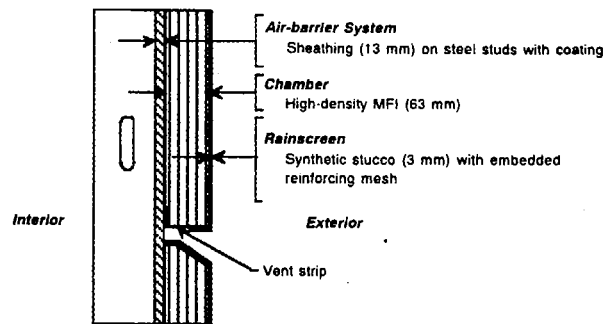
Vertical section of EIFS wall test specimens (specimens 1 and 2)
